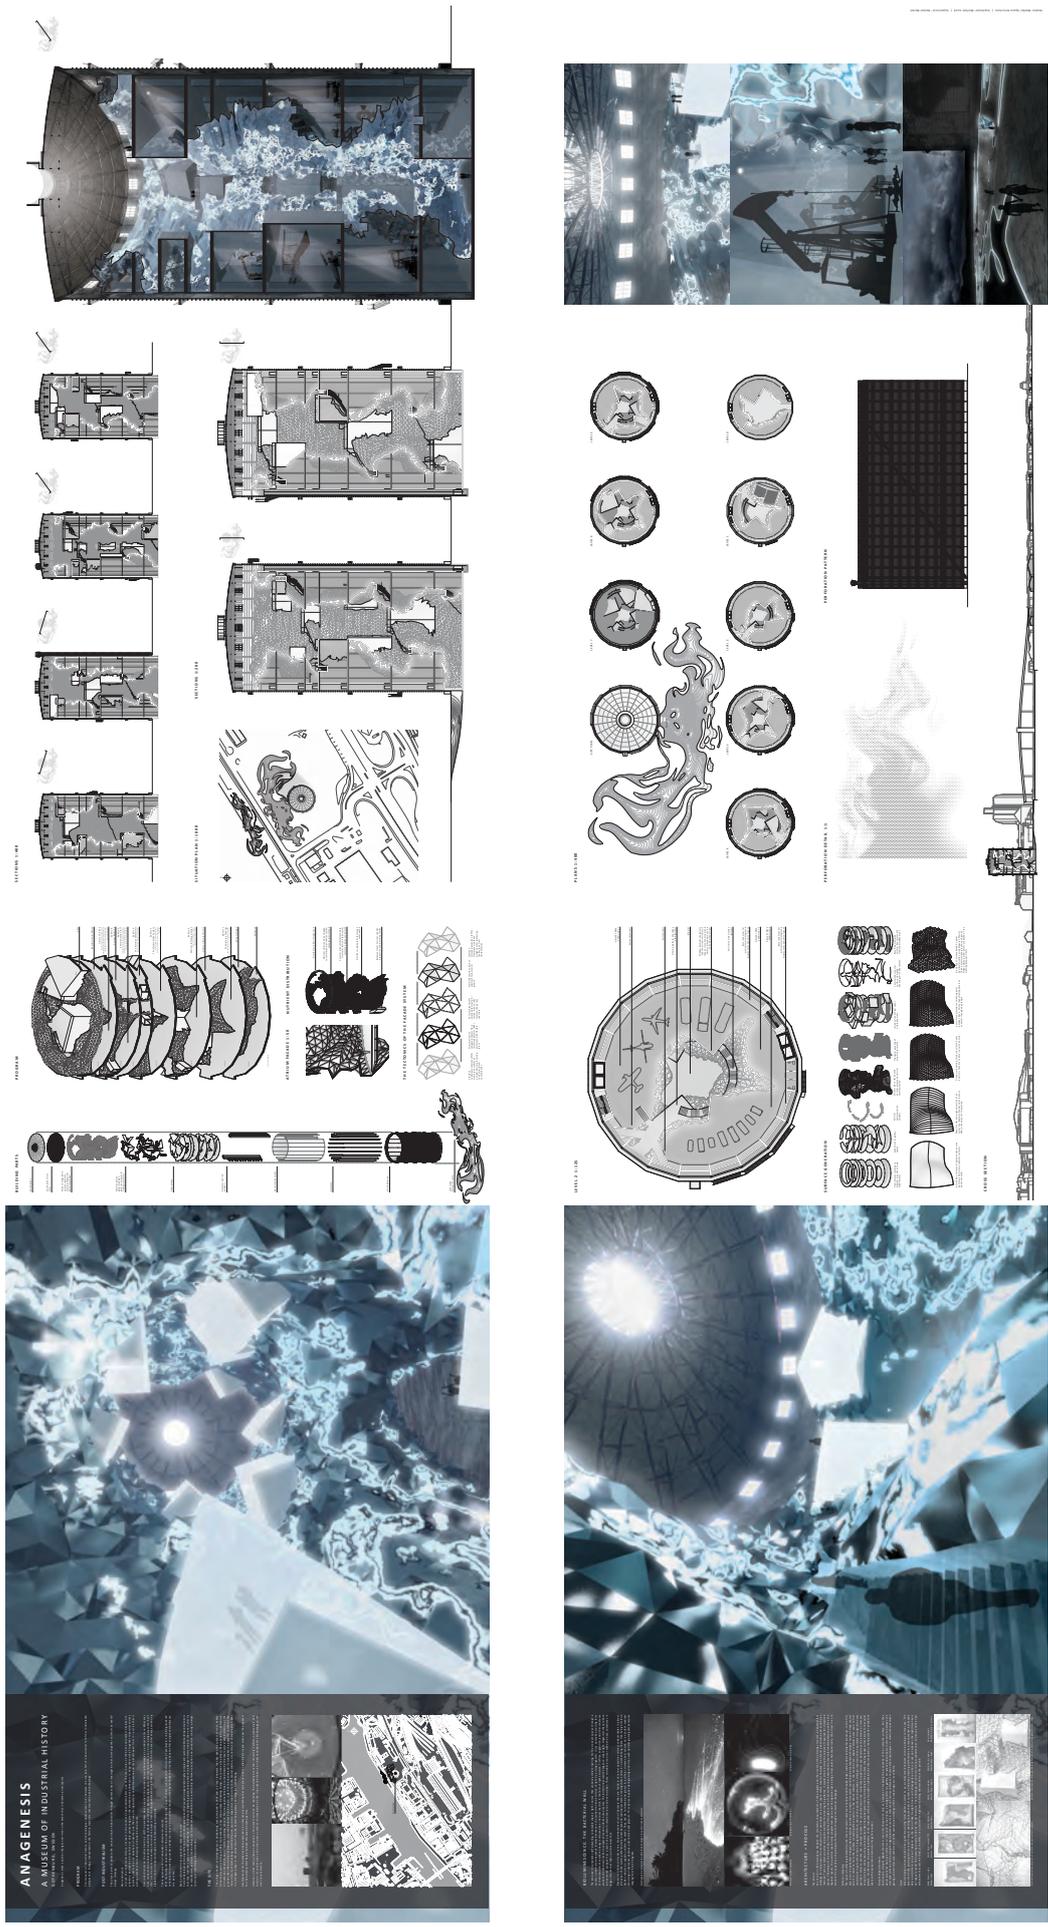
Final presentation panels (2 panels). Single panel dimension: 841mm x 3365mm
